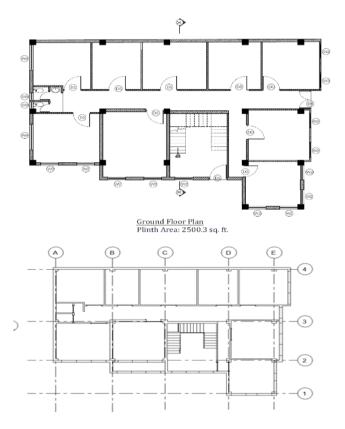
AutoCAD 2D architectural floor plan and structural 2D grid plan.
